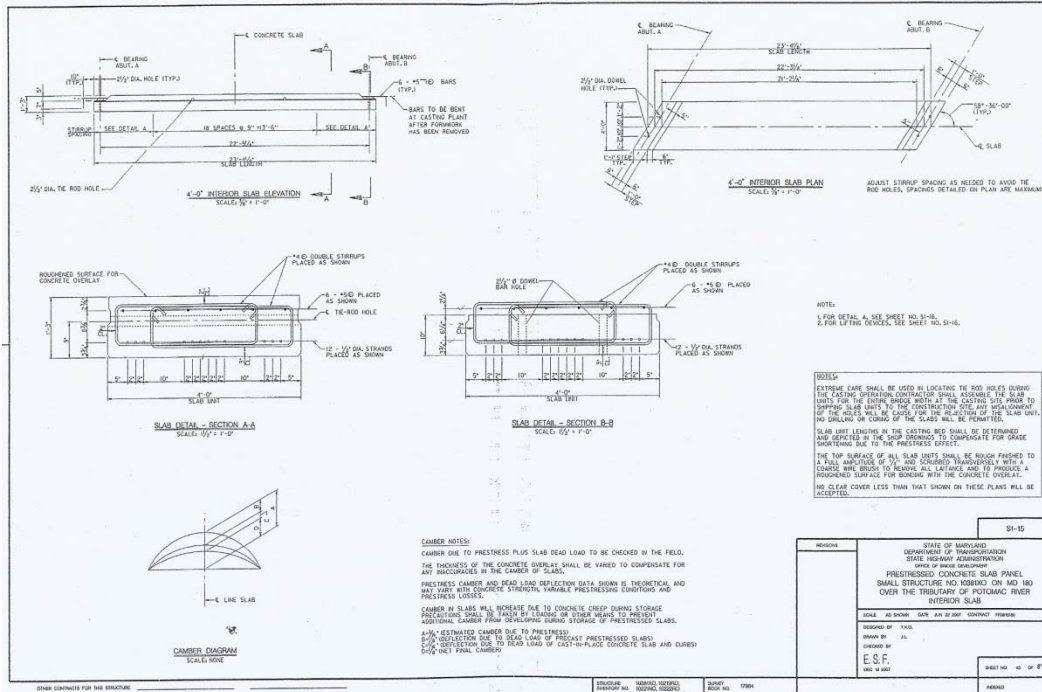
Slab Details of the Knoxville, MD, Bridge
